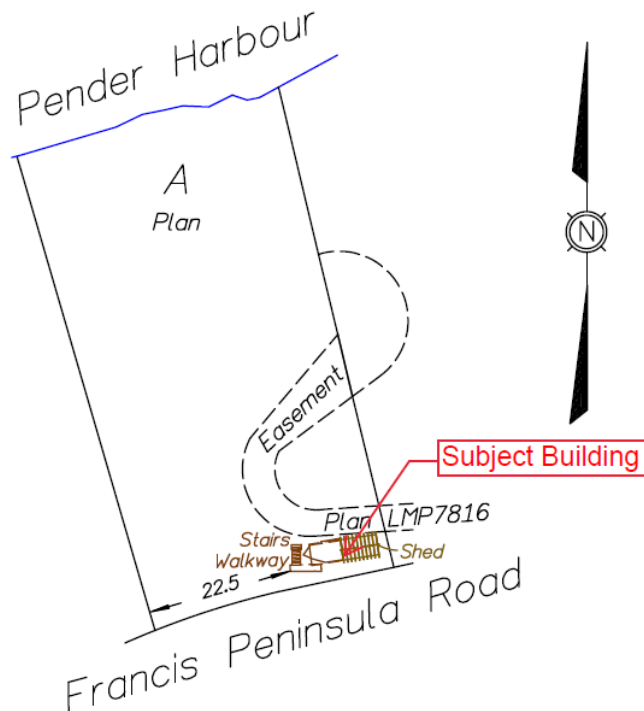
Site Plan (Note: the Site Survey (Attachment A) is also attached to the report)
